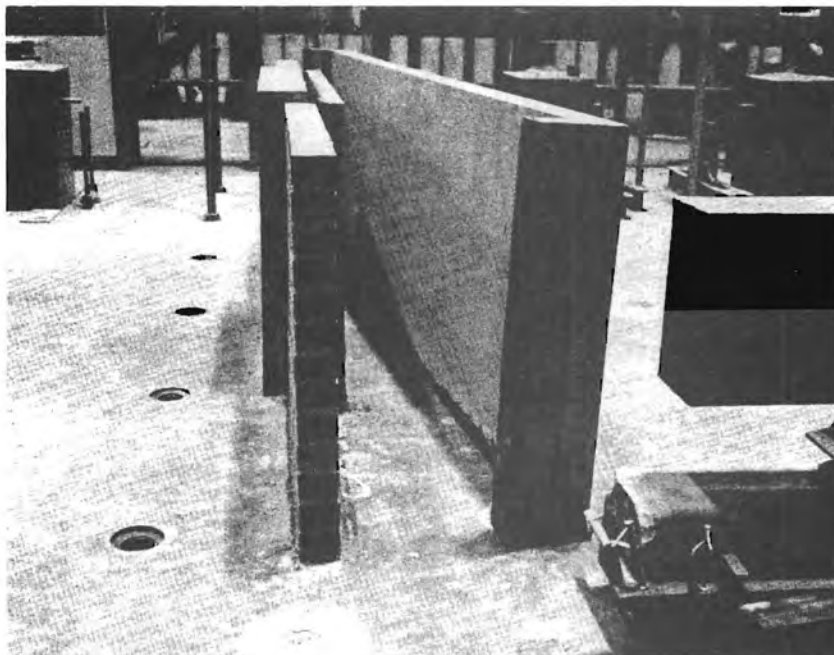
View 1. Bulkhead to contain water against the wall and closure
